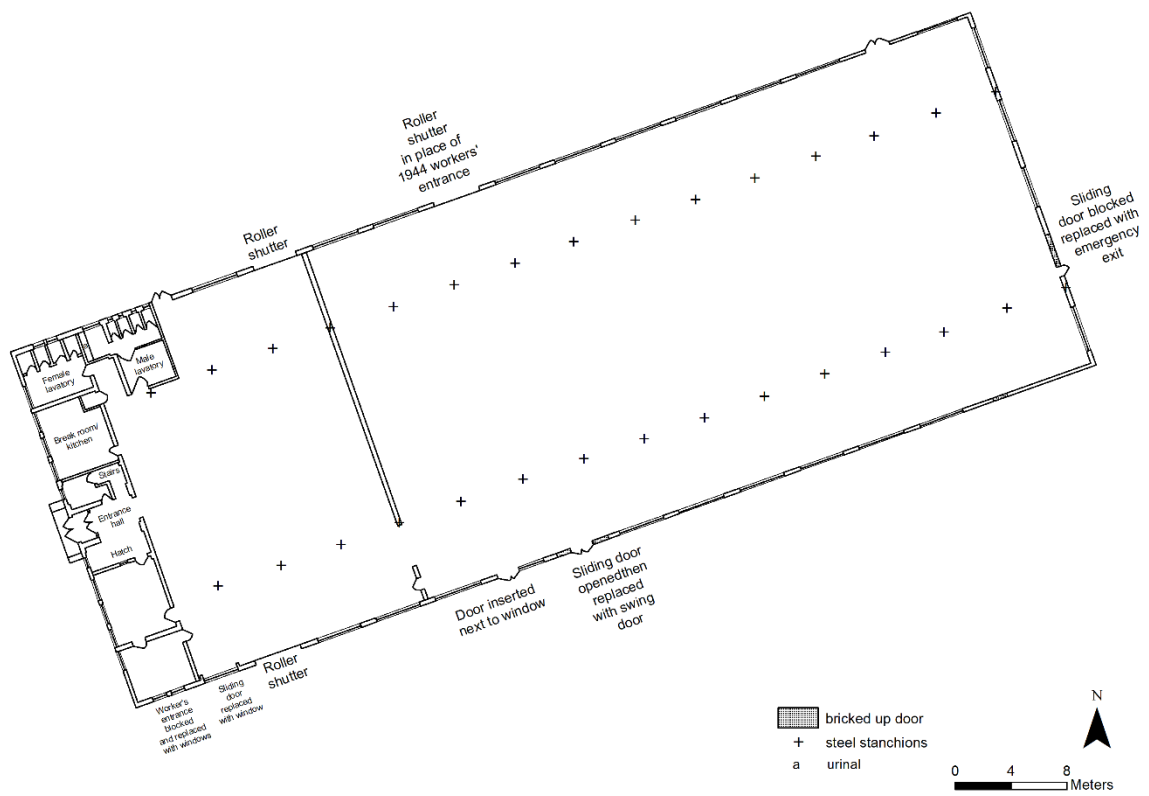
plan of L50 as it is now based on surveys made in December and January 2018/9. The lavatories were not accessible and so are based on building control plan TWAM CB.GA/BC/plan/1971/126.
